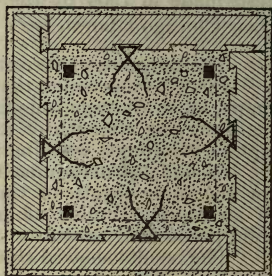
Terra-Cotta Casing for Reinforced Concrete Column.
